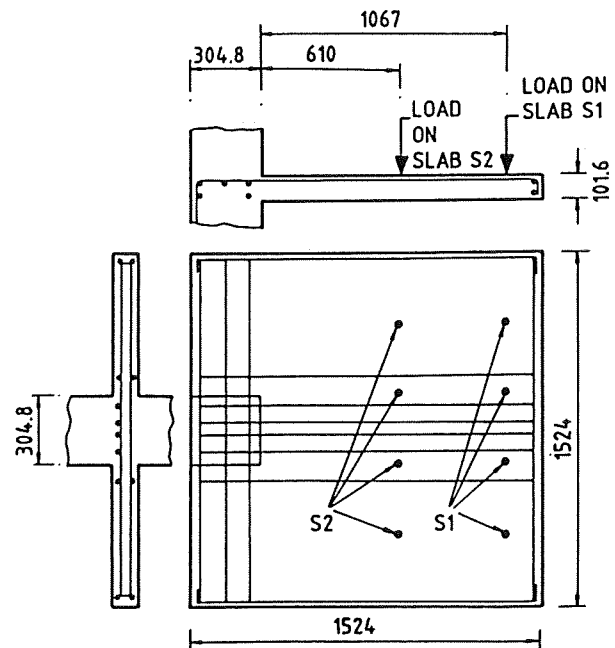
Illinois slab-column connection tests—geometry, bonded reinforcement layout and loadings.
